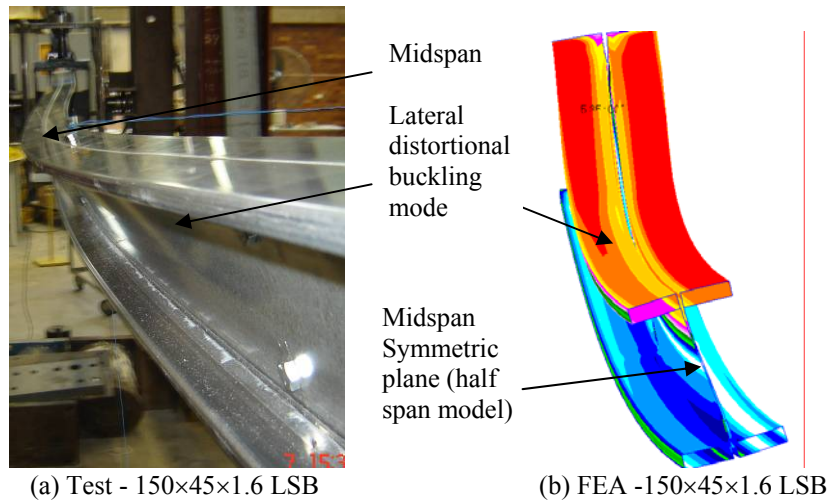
Typical specimen deformation at failure (a) Tested specimen (b) Experimental finite element model
